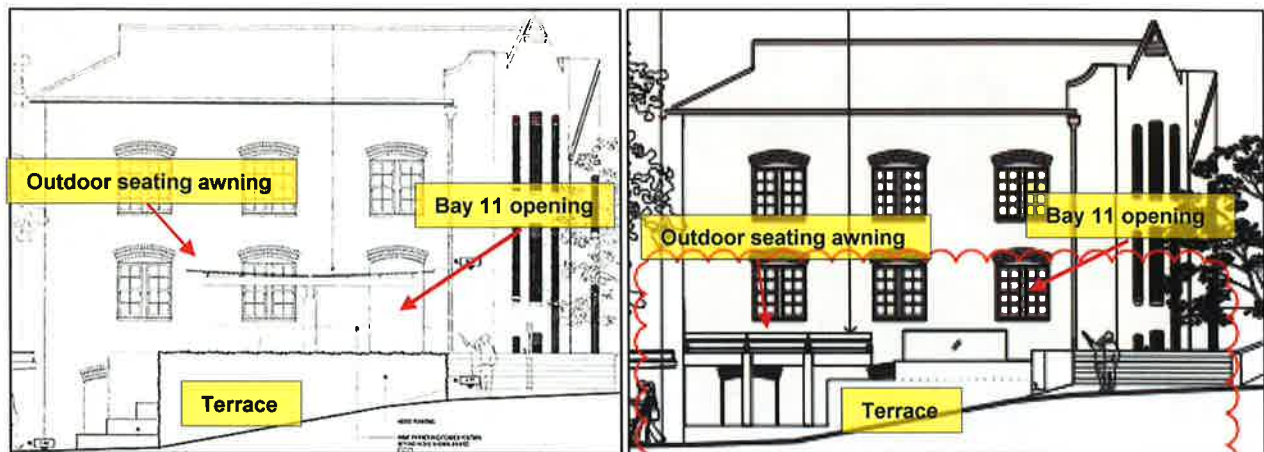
Previously approved north elevation and proposed north elevation (Source: Approved plans for SSD 7056 and Applicant's modification application).
